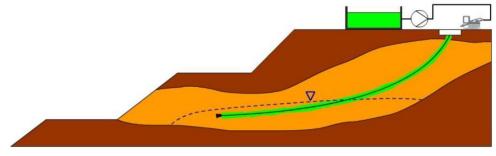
Scheme Horizontal Directional Drilling (Harzer (2012))
